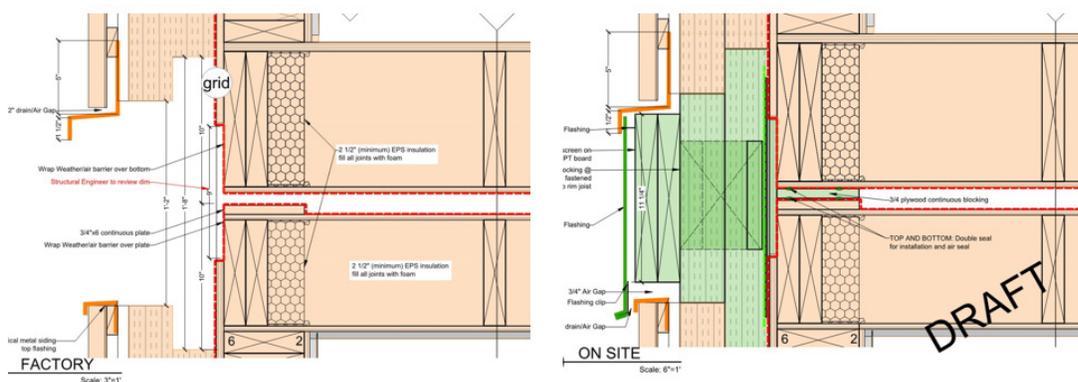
Case Study #2: Example detailing of horizontal stack joint between modules
